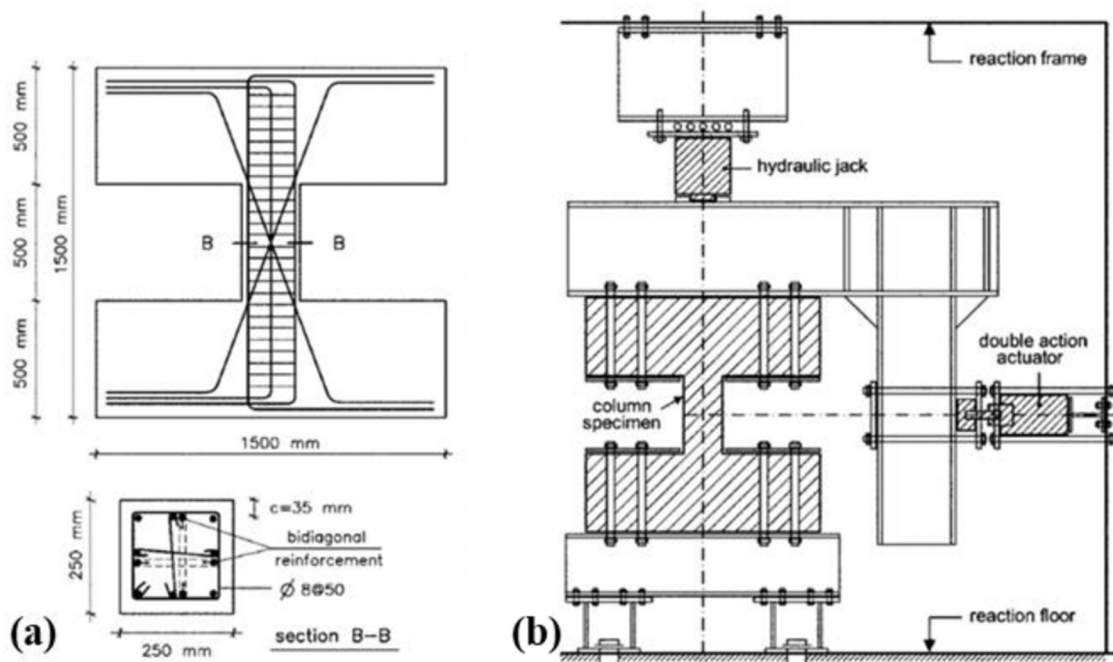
(a) Specimen cross-section and reinforcement, and (b) test setup [18].
